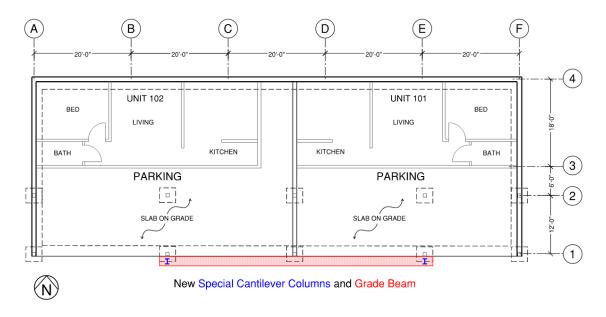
First-story plan of the long-side-open building with proposed retrofit elements.
